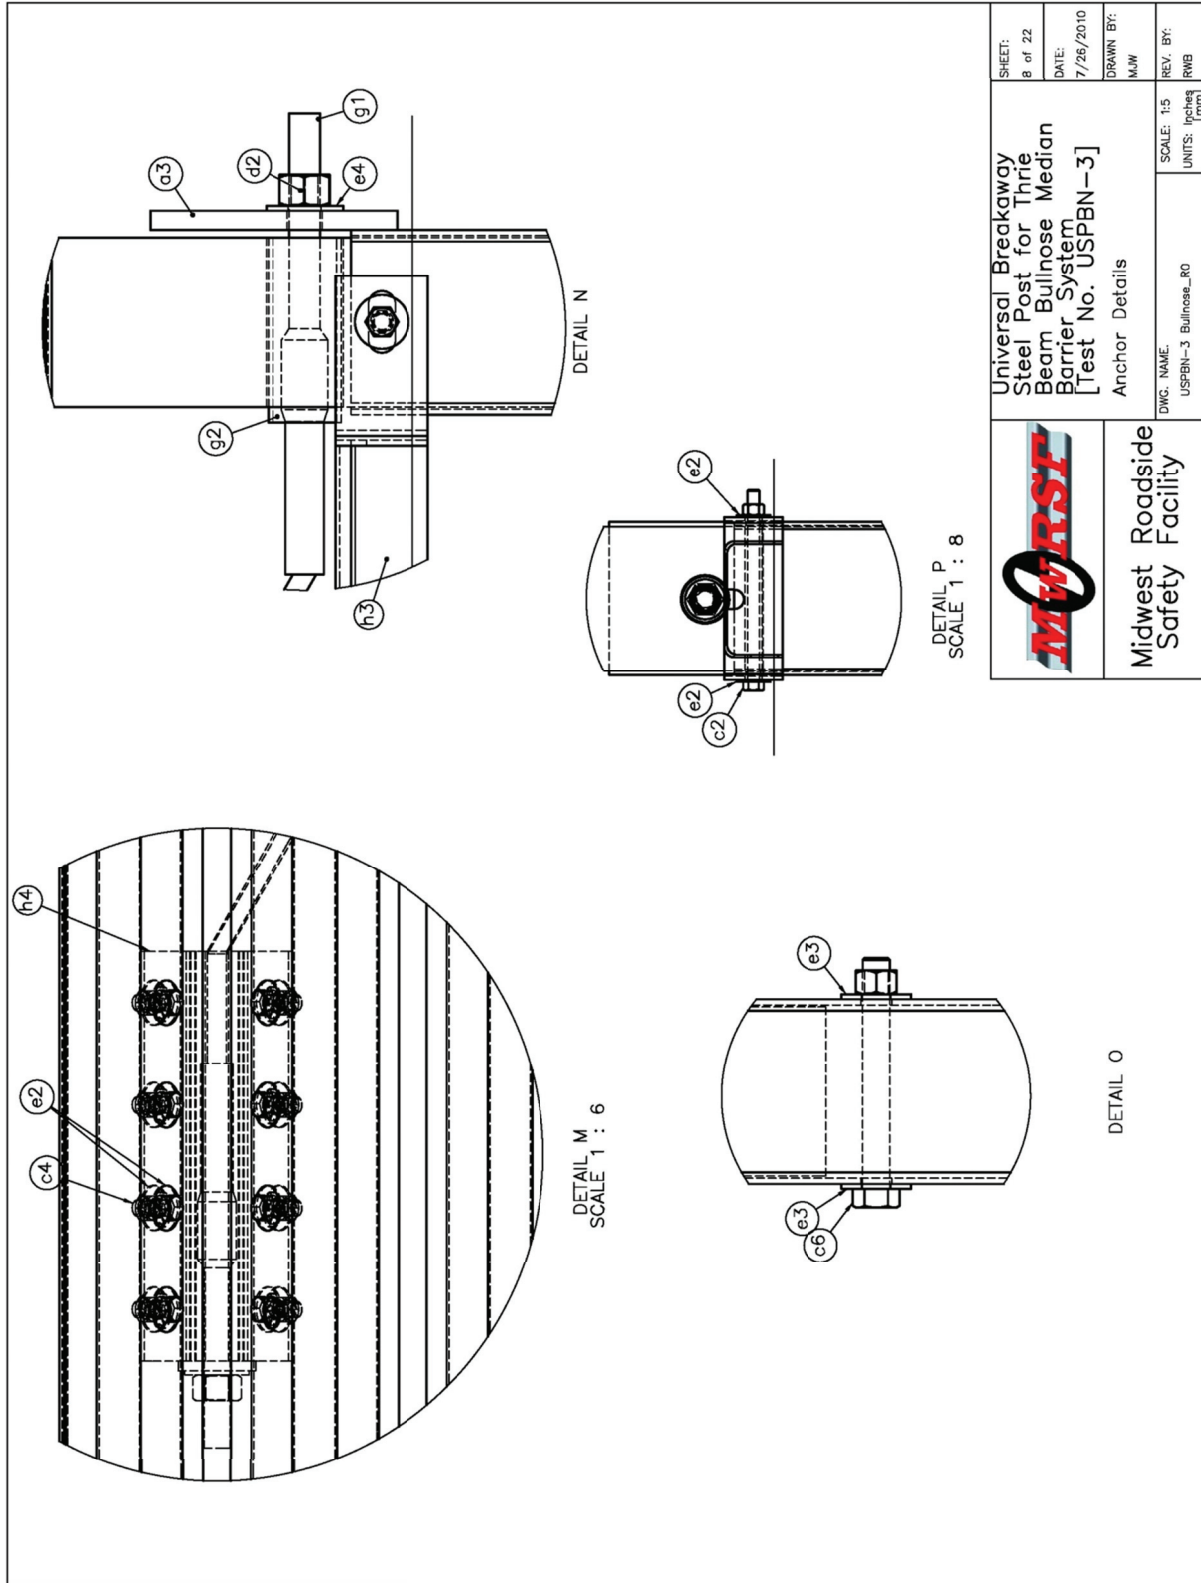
Anchor Details, Test Nos. USPBN-3 and USPBN-4
